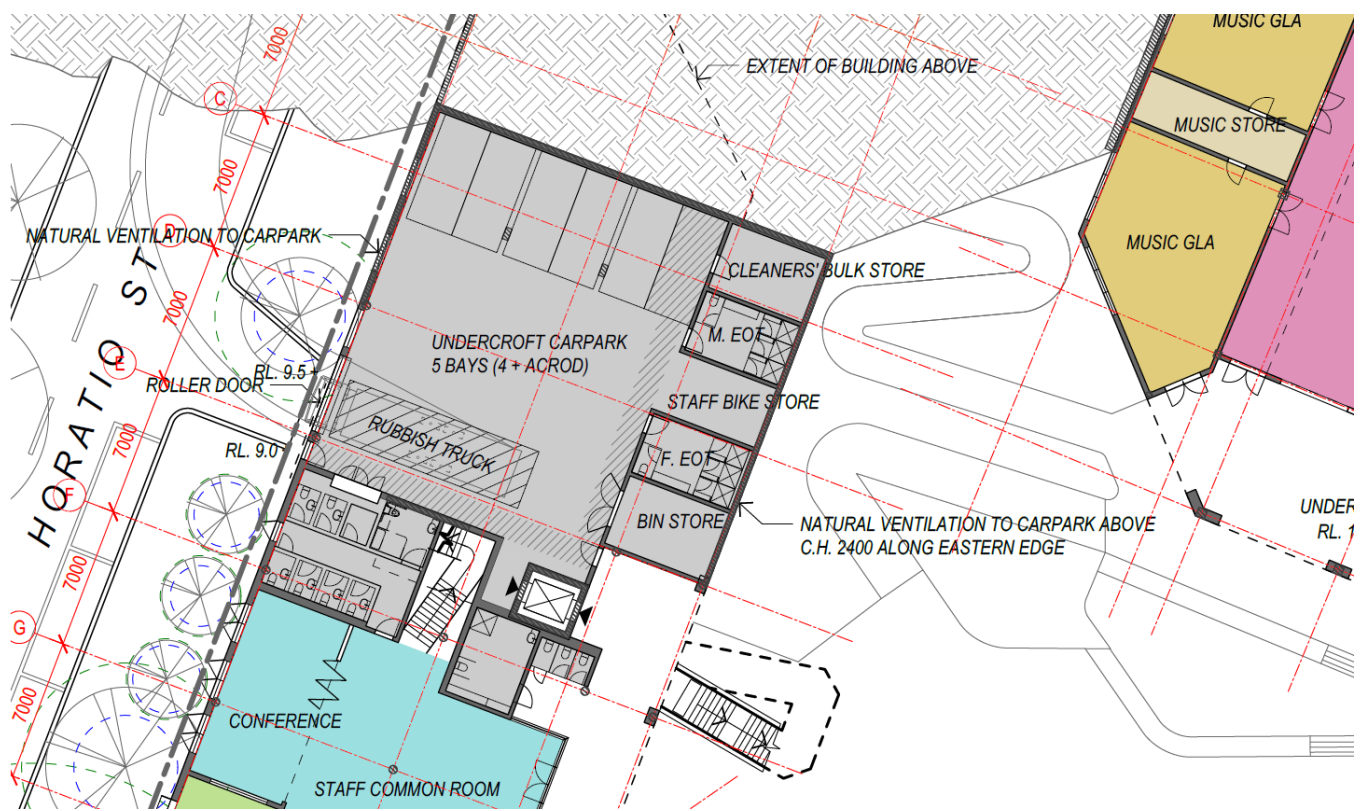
School administration parking bays off Horatio Street (source: EIW/ARM)
